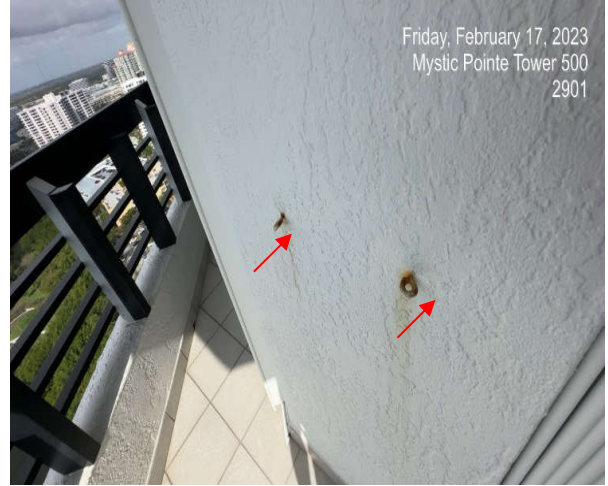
b.18 – Corroded embedded metal at balcony wall (Unit 2901)
